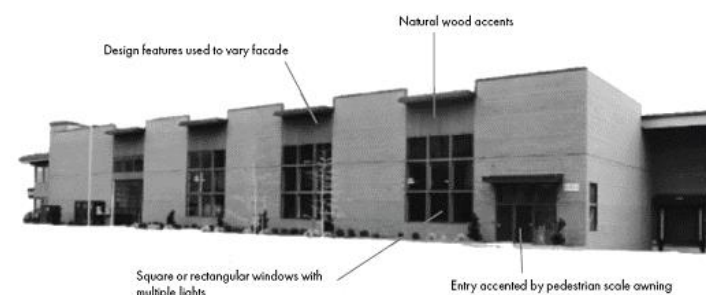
ARTICULATED BUILDING FACADE<sup>4</sup>
